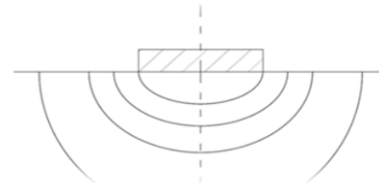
Ideal Pattern of Reinforcement beneath Footing (Jones 1996)
